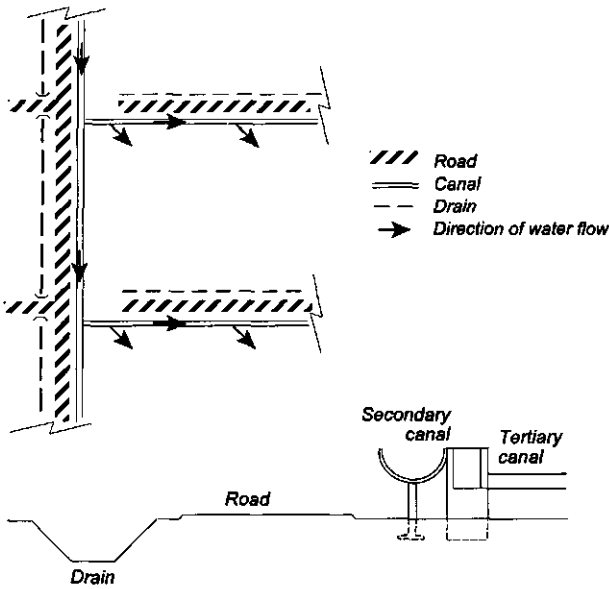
Alternative layout of Moroccan open canal irrigation systems (not to scale, after Jones 1994).
